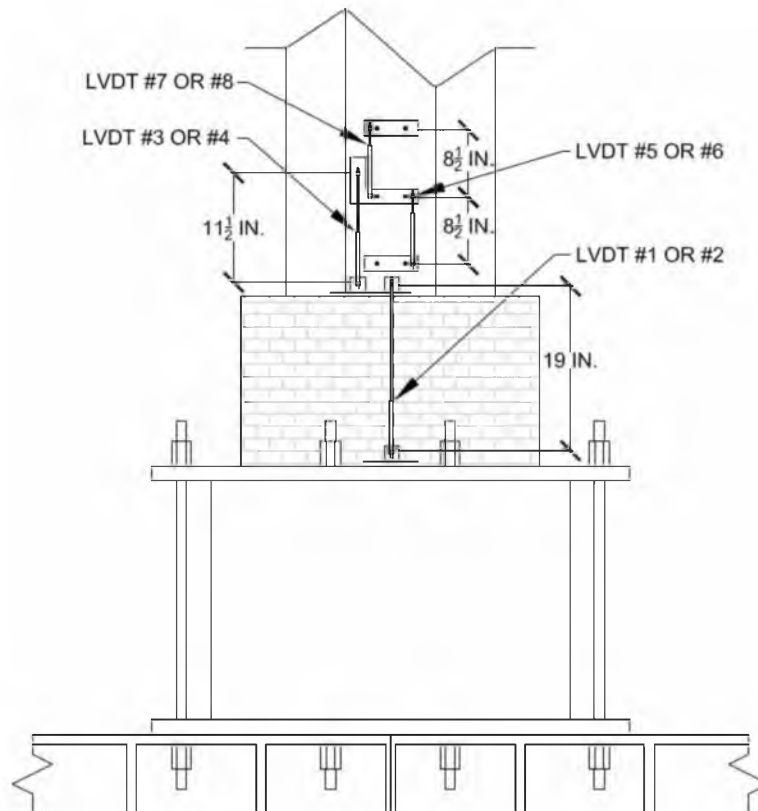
Typical LVDT layout of east or west column face with approximate dimensions
